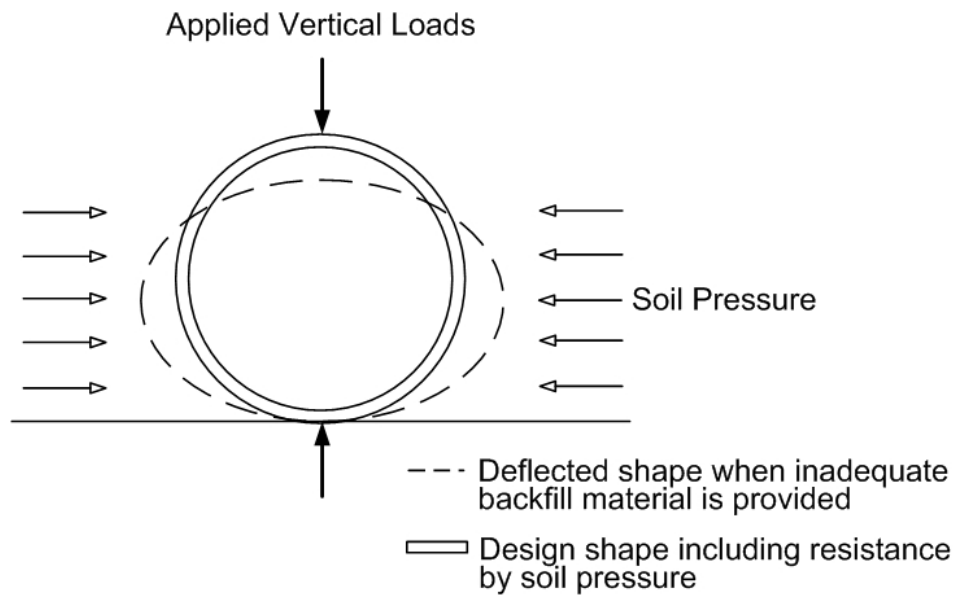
Flexible Culvert: Load vs. Shape
